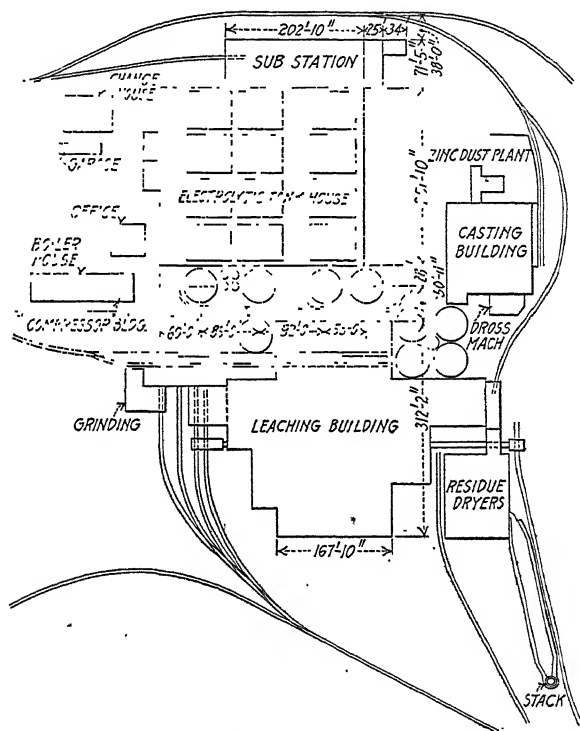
GENERAL PLAN OF 150-TON PLANT.
